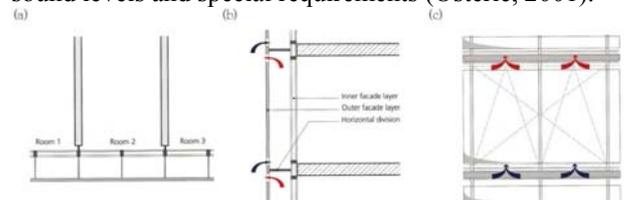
Box-window type: Plan (a); section (b); elevation(c) (Osterle, 2001)
